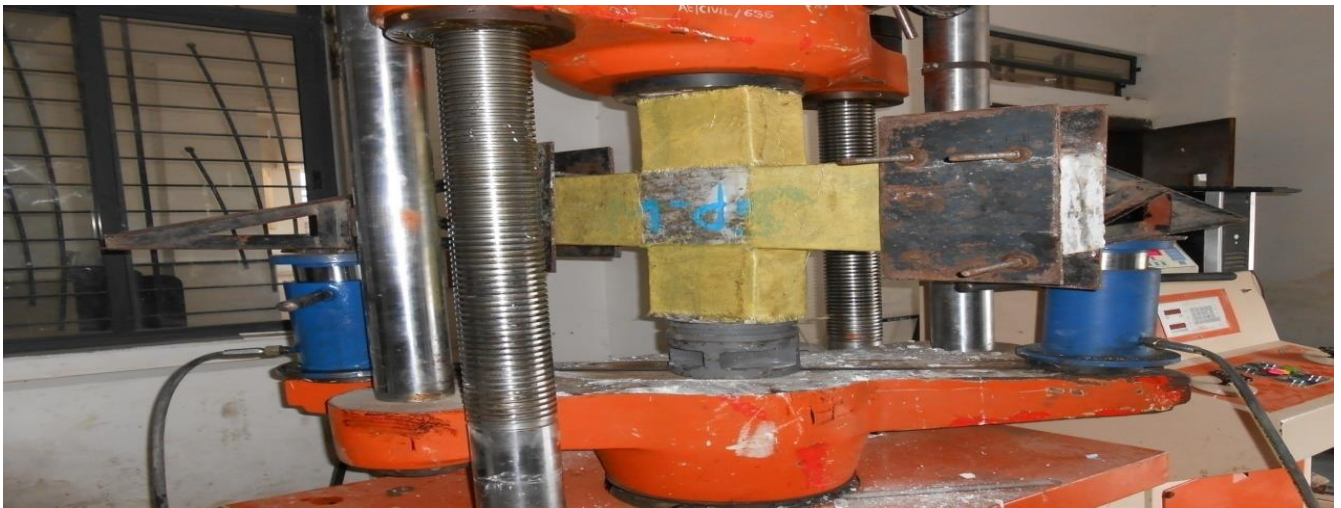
Experimental setup for controlled Beam-Column Joint specimen
